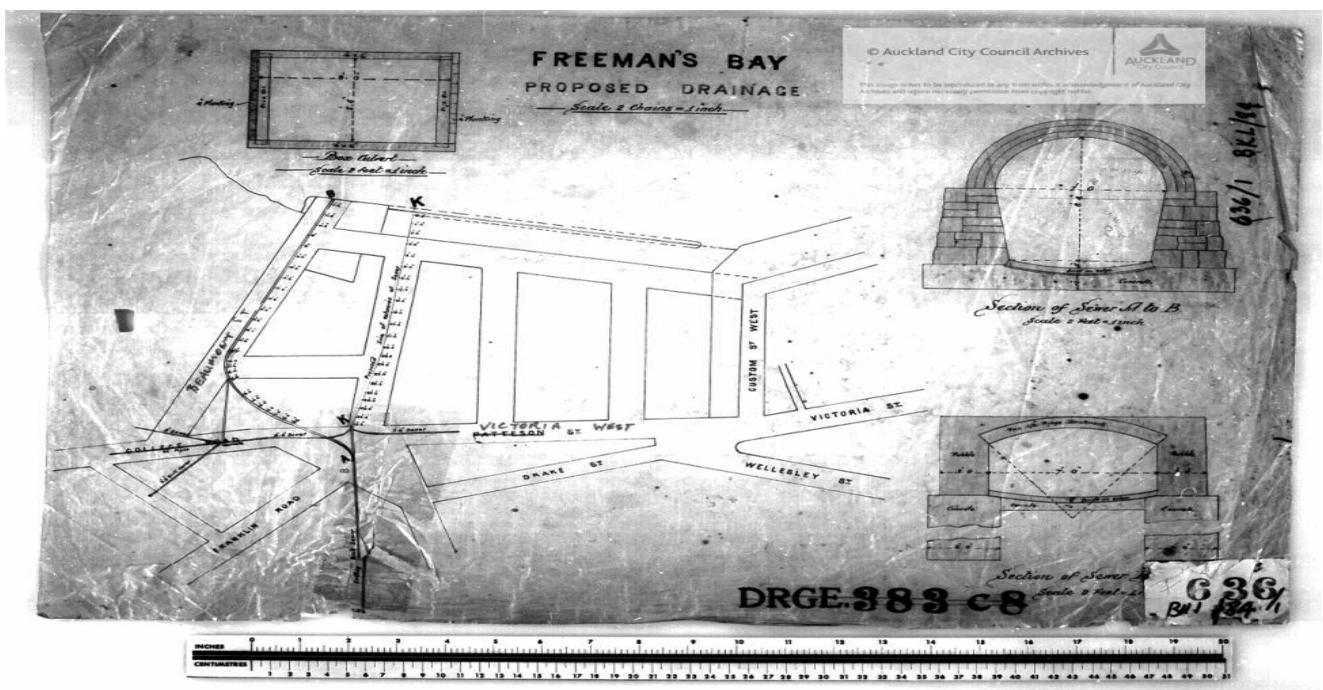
Plan of proposed drainage at Freemans Bay. The plan is undated. However, it seems that some of the drainage (on Beaumont St, Victoria St, and Franklin Rd) may have been already present, with only one section from K-K stated as a 'proposed line of extension of sewer' (indicated by the arrow). This suggests that the plan post-dates the Drake Street to Patterson Street reclamation (between 1873 and 1880), and was probably drawn after the Beaumont St reclamation (1885-1888) and prior to or during the Victoria Park reclamation in 1886-1901 (Auckland Council Archives 033, DRGE 636)
